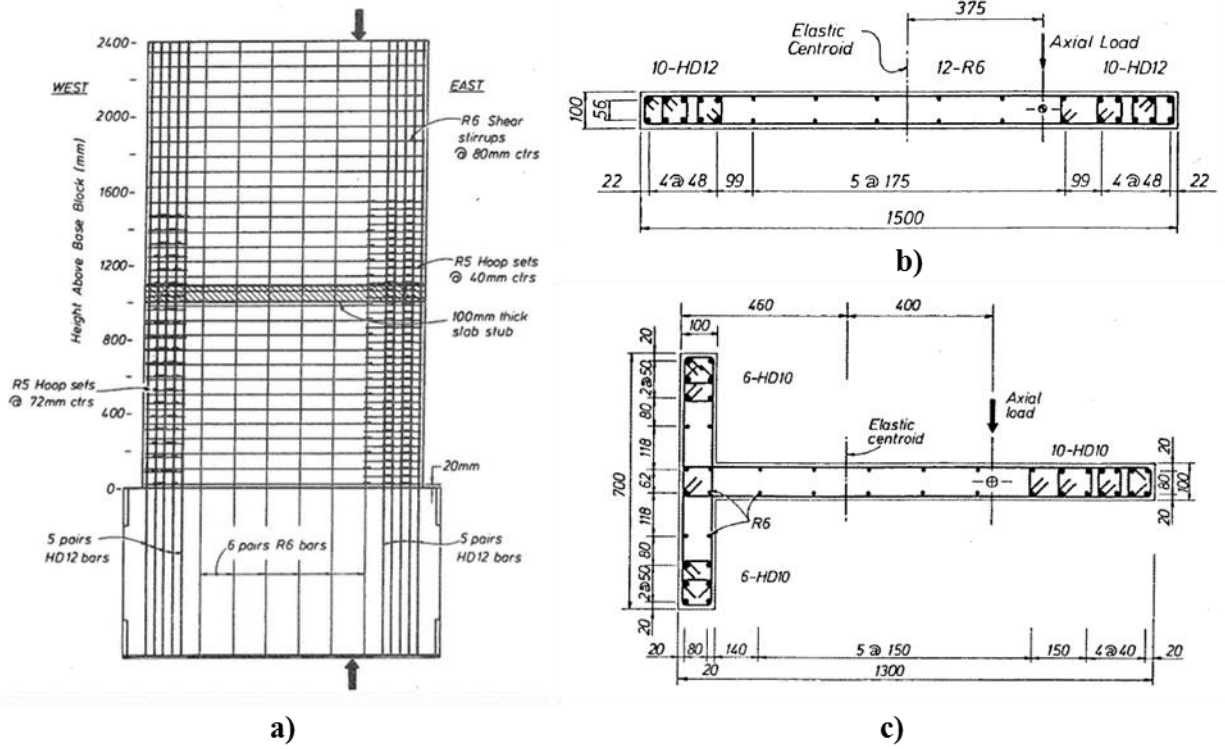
Paulay & Goodsir (1985) specimen dimensions and reinforcement – a) Elevation view, b) Rectangular walls, and c) T-shape Wall (Wall 3)
